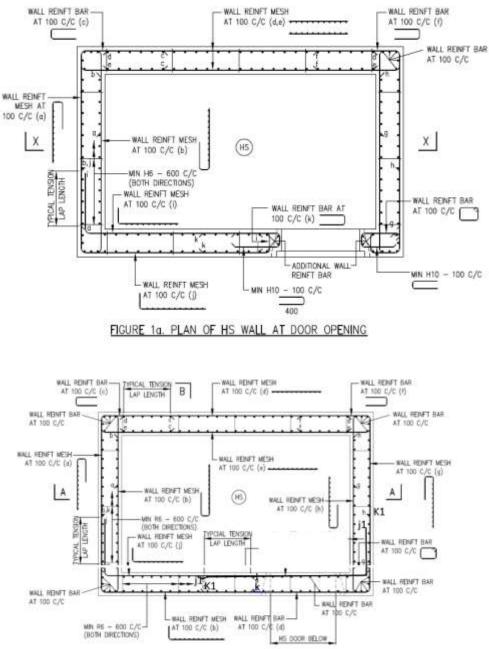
PLAN OF HS AND SS WALL ABOVE DOOR OPENING
